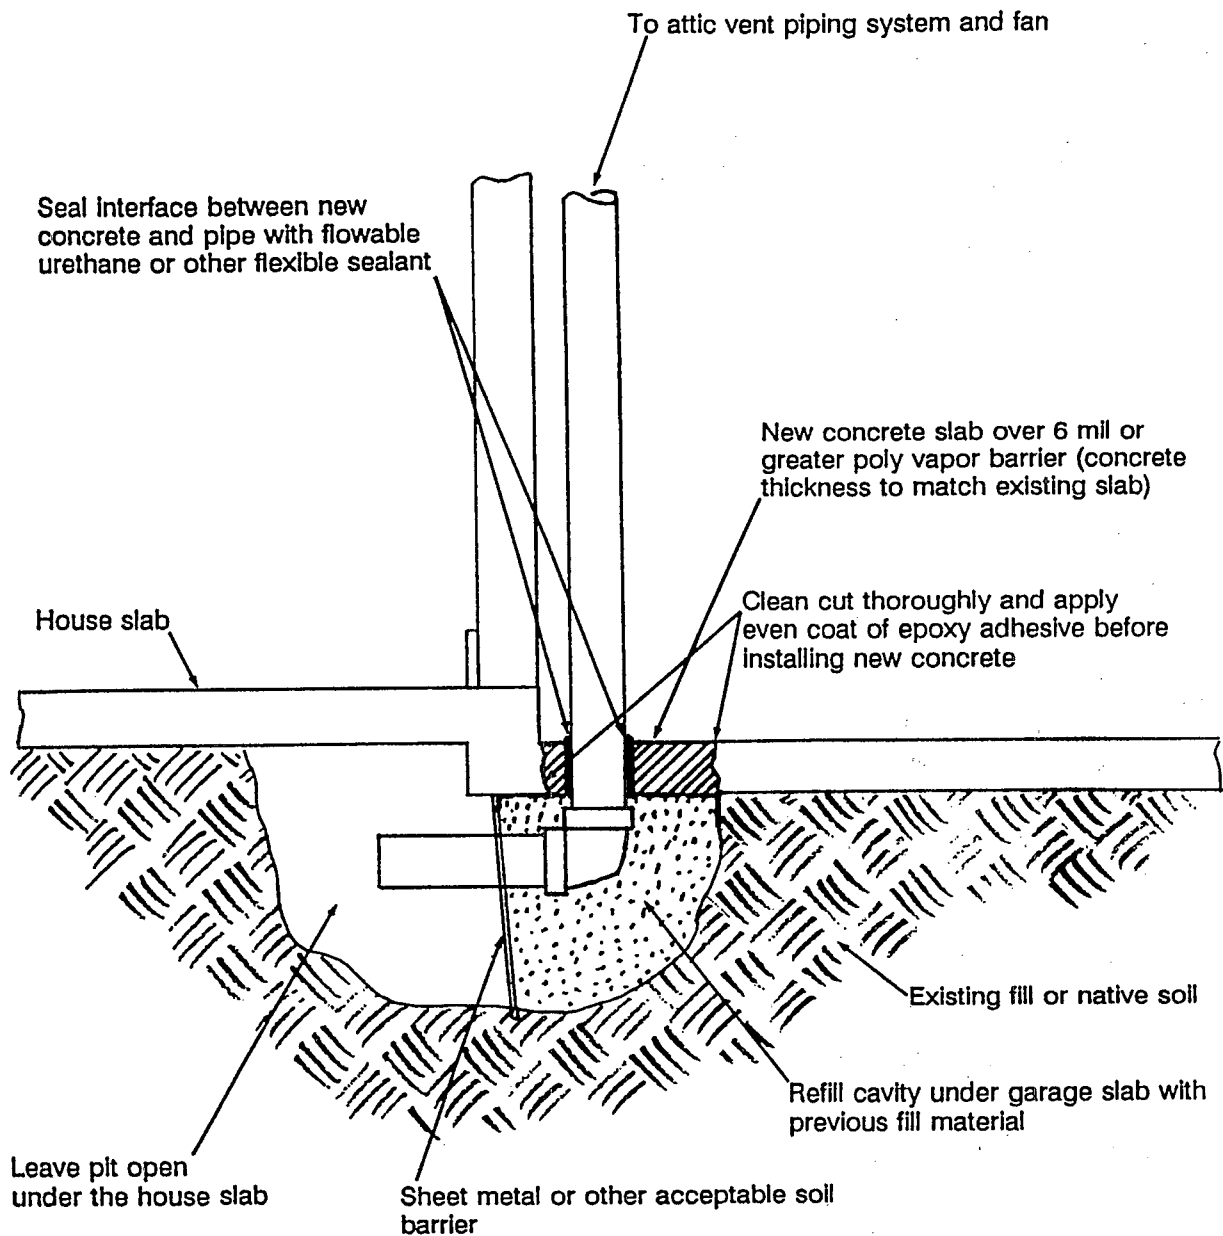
Illustration of a garage suction pipe horizontal installation into a pit under the house slab in a house where the garage slab is a step-down form pour from the house slab. If the house and garage slabs are separated by a stem wall, then the pipe goes in through that wall rather than the sheet metal as pictured here.
